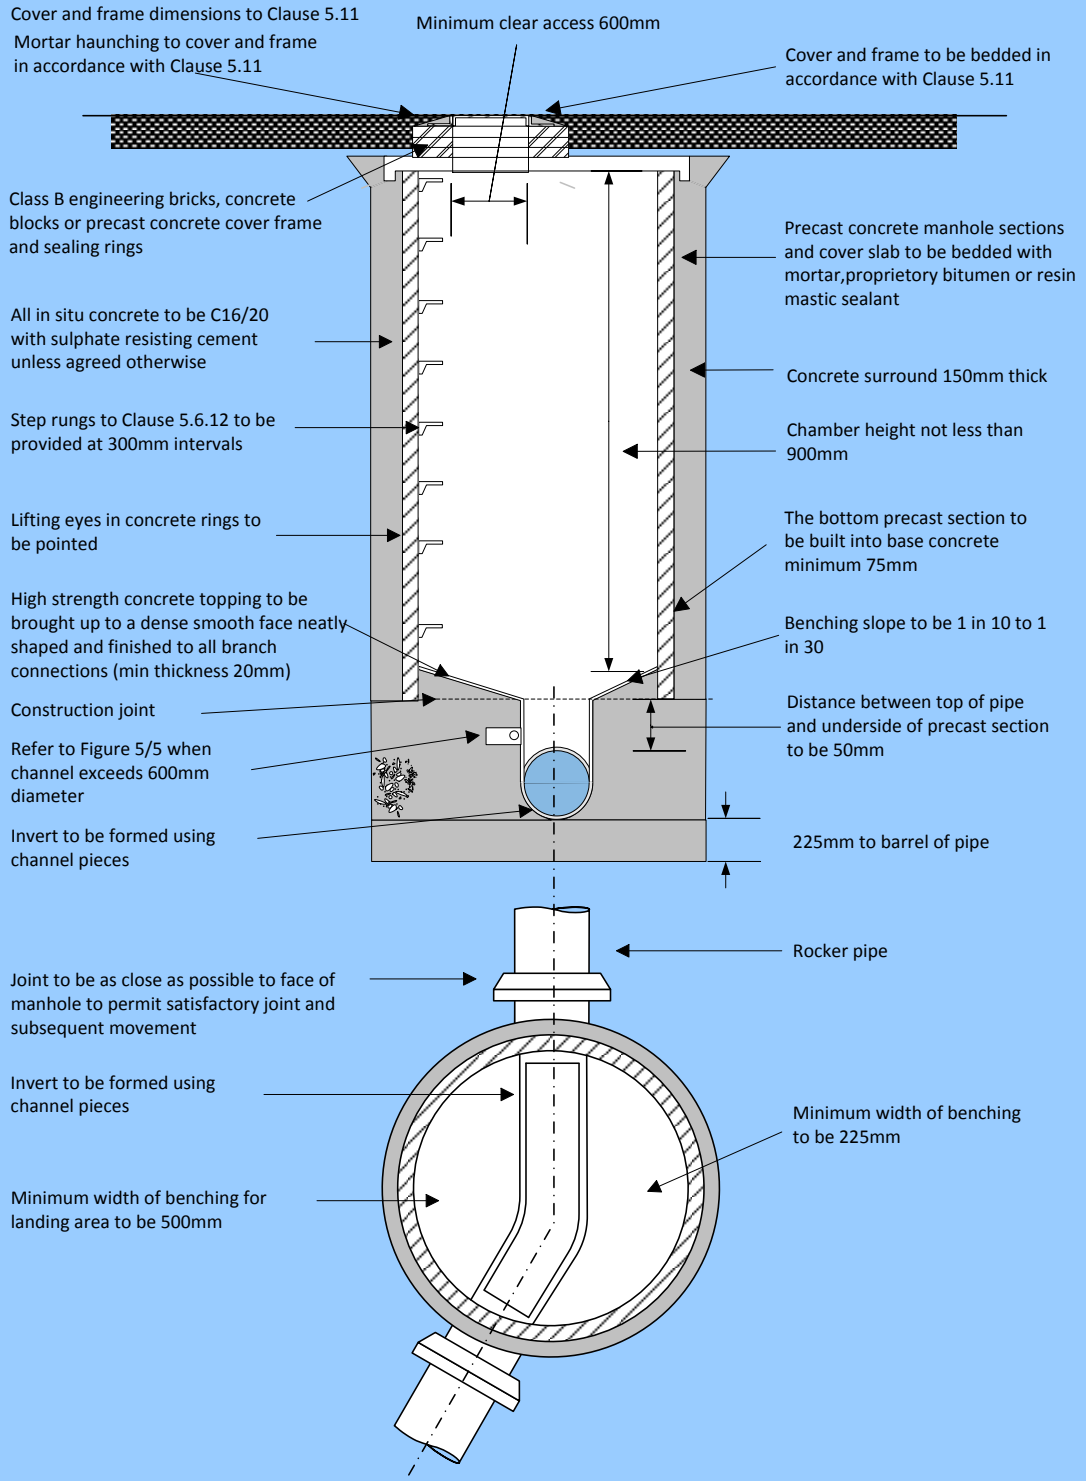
/3 - TYPICAL MANHOLE DETAIL - TYPE C
